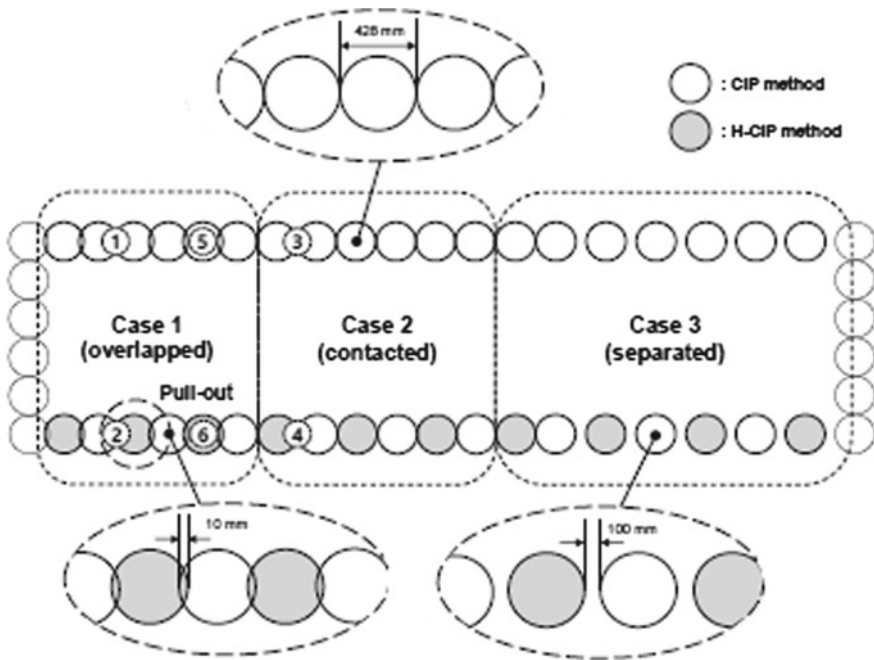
Layout of CIP construction for field pilot test (Lee et al. 2017)
